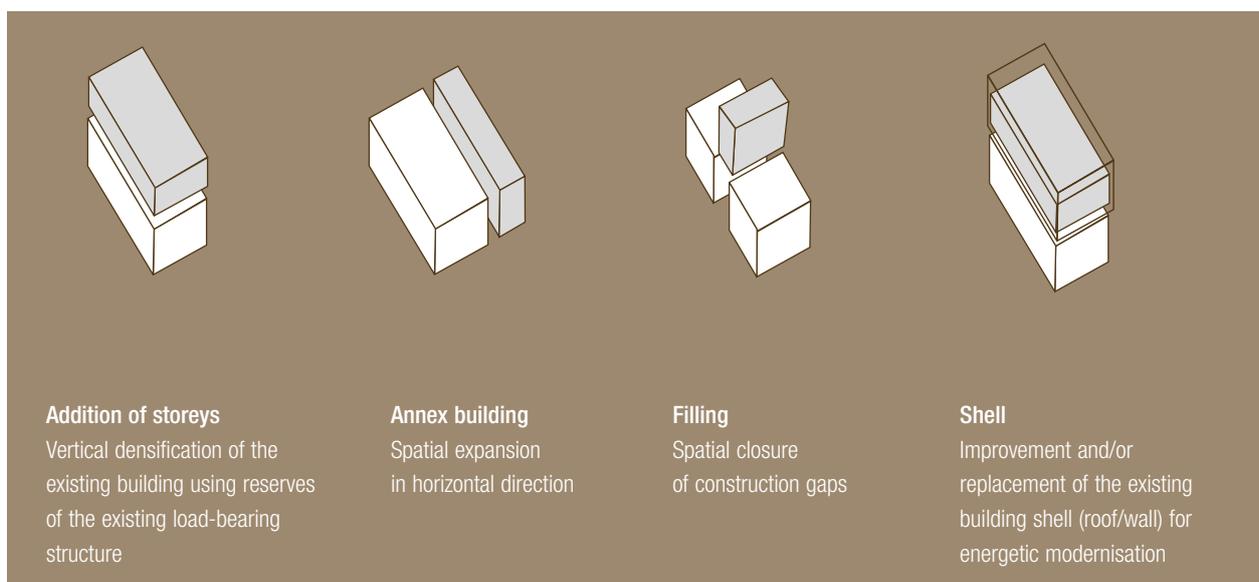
Building redevelopment with wooden elements, proHolz Austria
